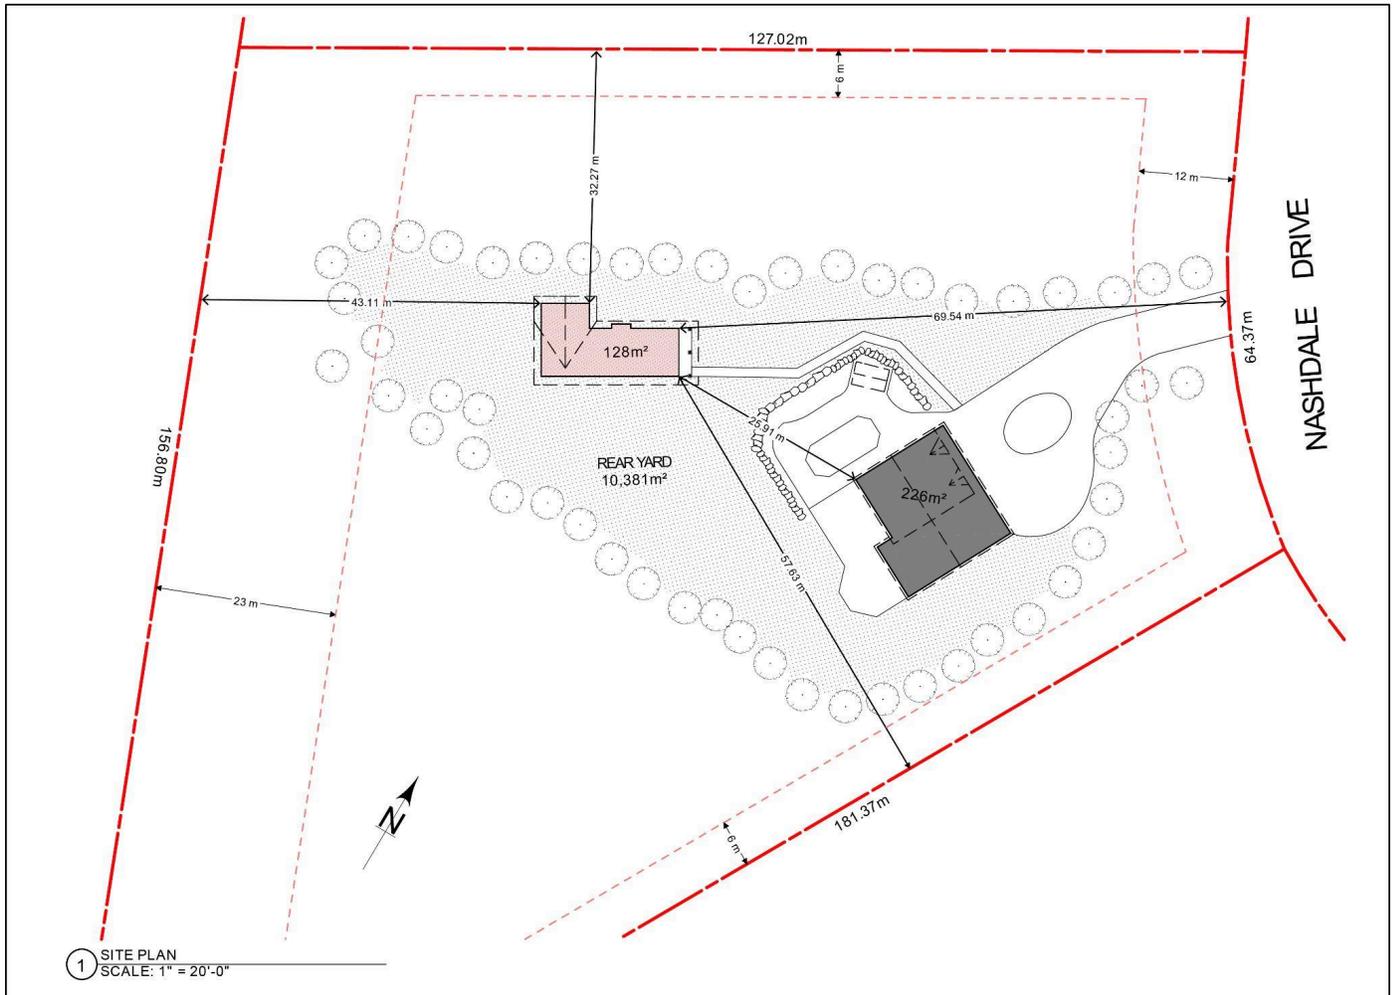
Site plan, dated May 11th, 2025 by E Squared Engineering Inc.
